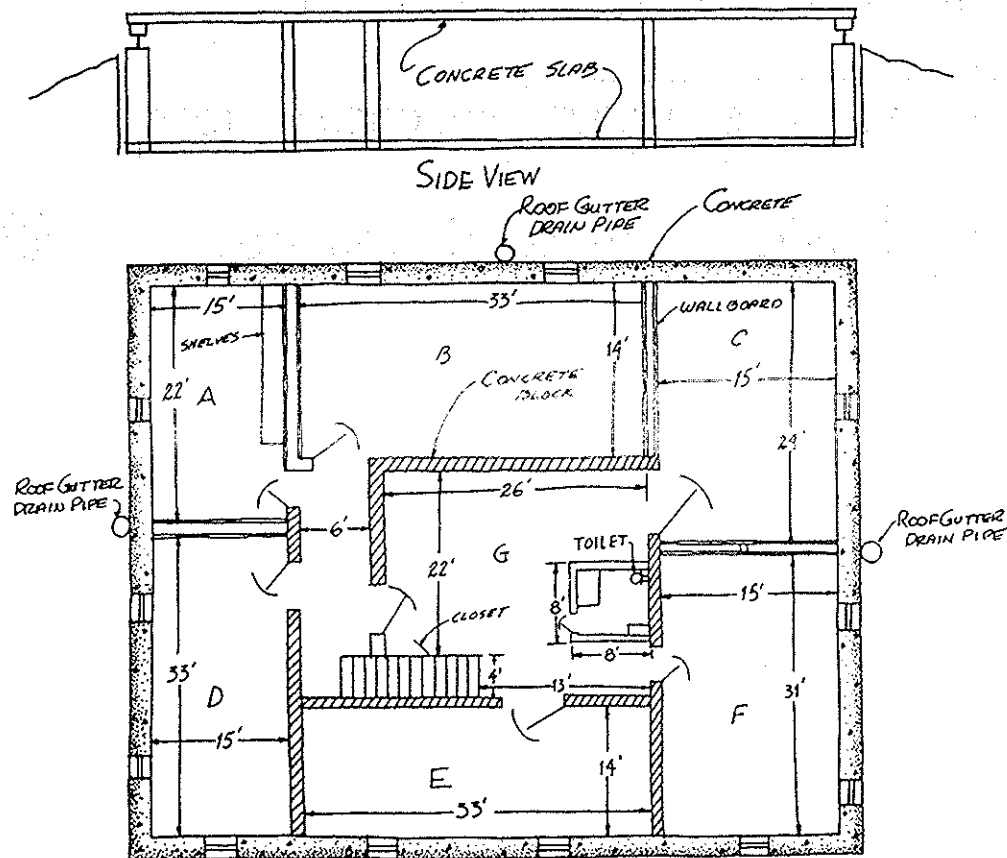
Example of a sketch of the floor plan of the basement of a make-believe apartment building called Erskine Hall.
